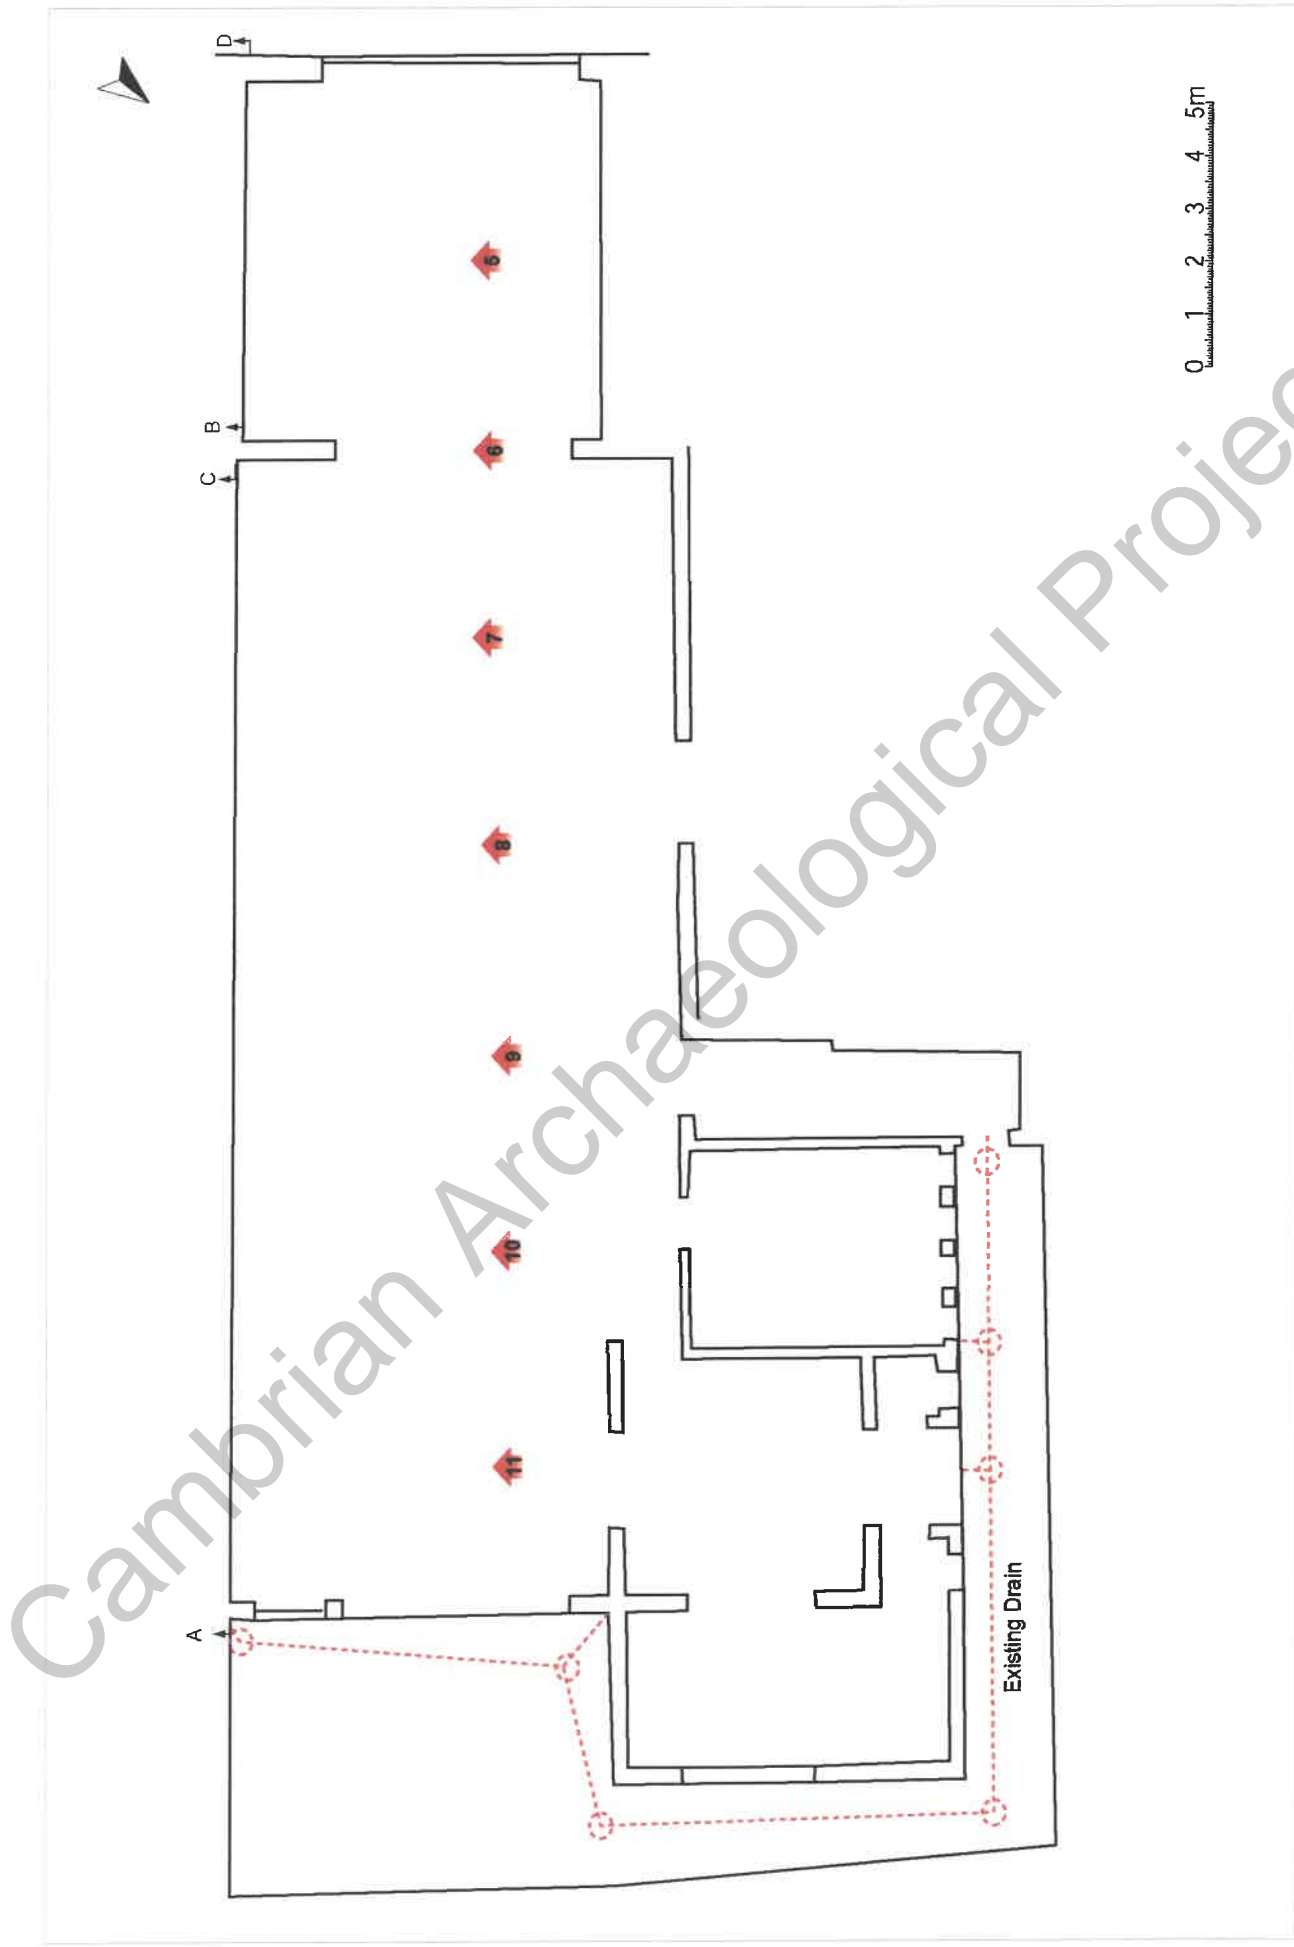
Plan of watching brief area showing location of elevations and direction of photographs
